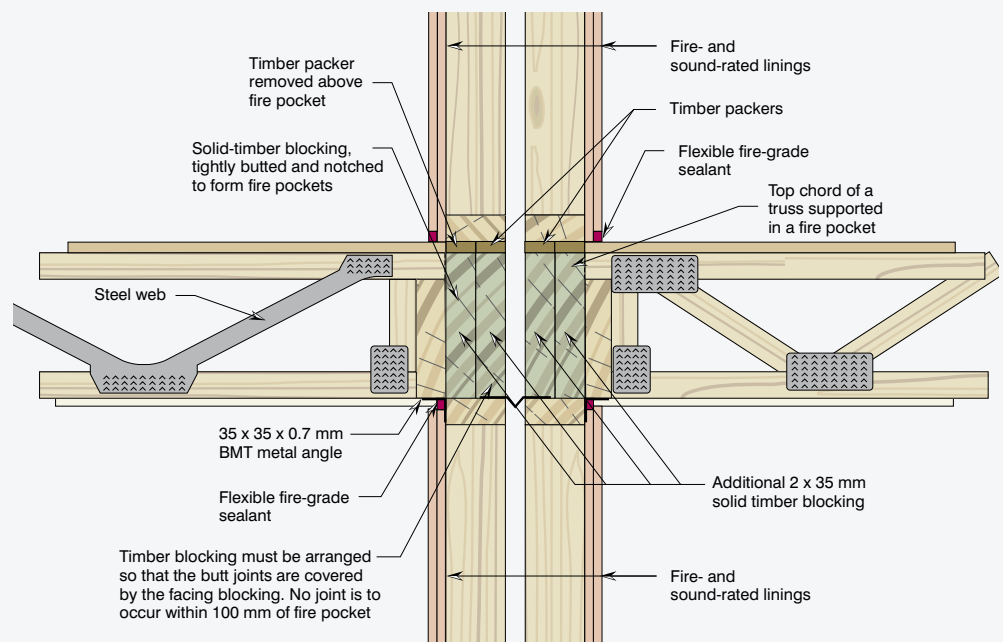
Floor-truss top chord supported in pocket – FRL 90 minutes – elevation view.
